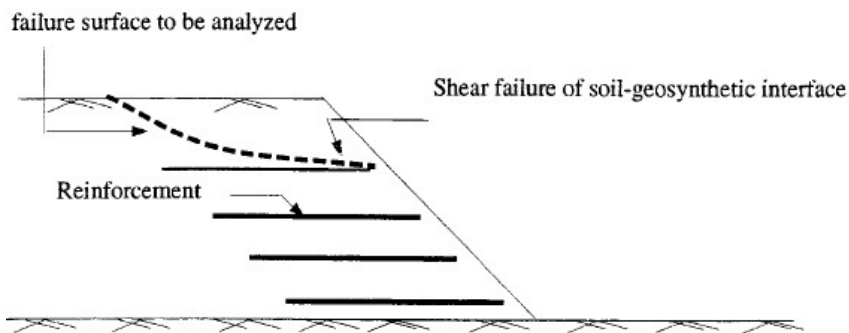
Typical sketch of sliding failure (Mallick et al.,1996)
